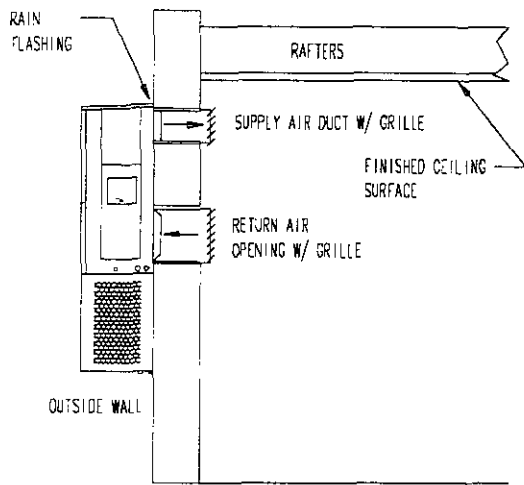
WALL-MOUNTING INSTRUCTIONS
